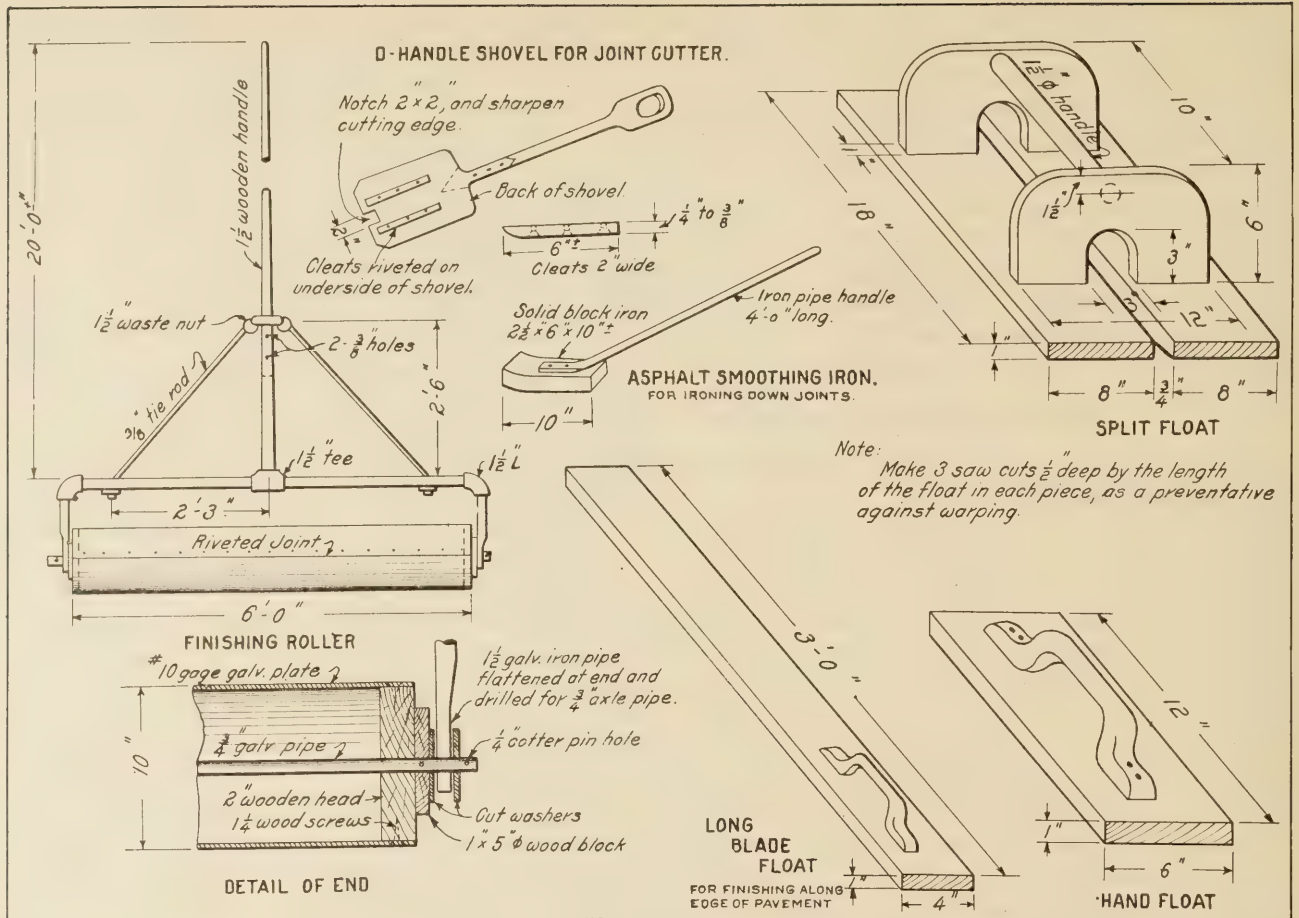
PLATE III. TOOLS USED IN THE CONSTRUCTION OF CONCRETE PAVEMENTS.
